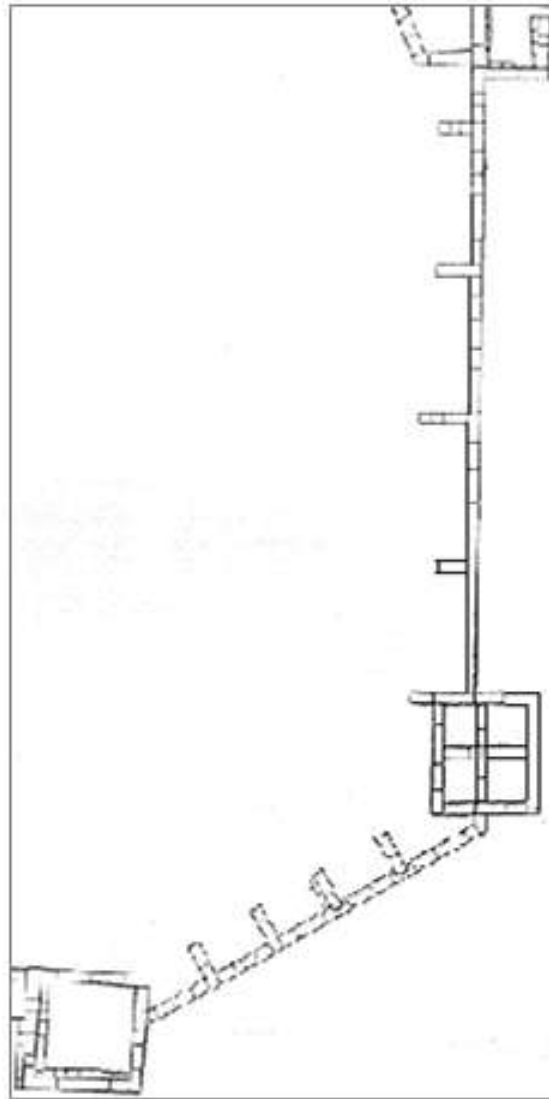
Restored plan of the east and southeast wall at Halai (adapted by author after Goldman 1940, Pl. III)
